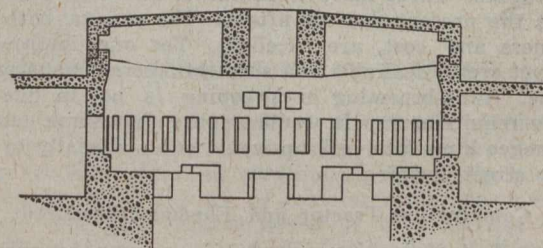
SECTION THROUGH STATOR AND BRIDGE
